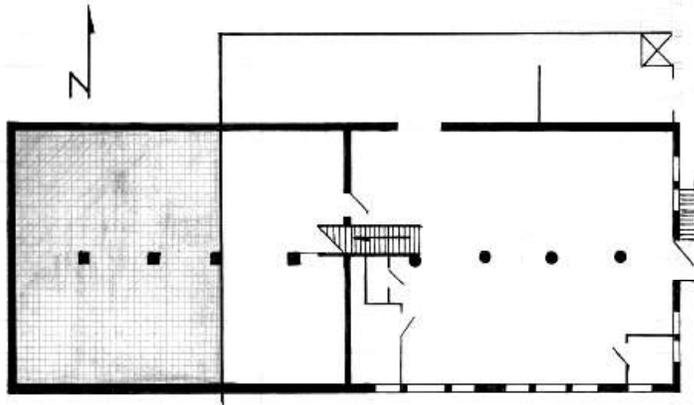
Image B: Basement Plan for the Journal Printing Company Building (2010). Not to scale.
